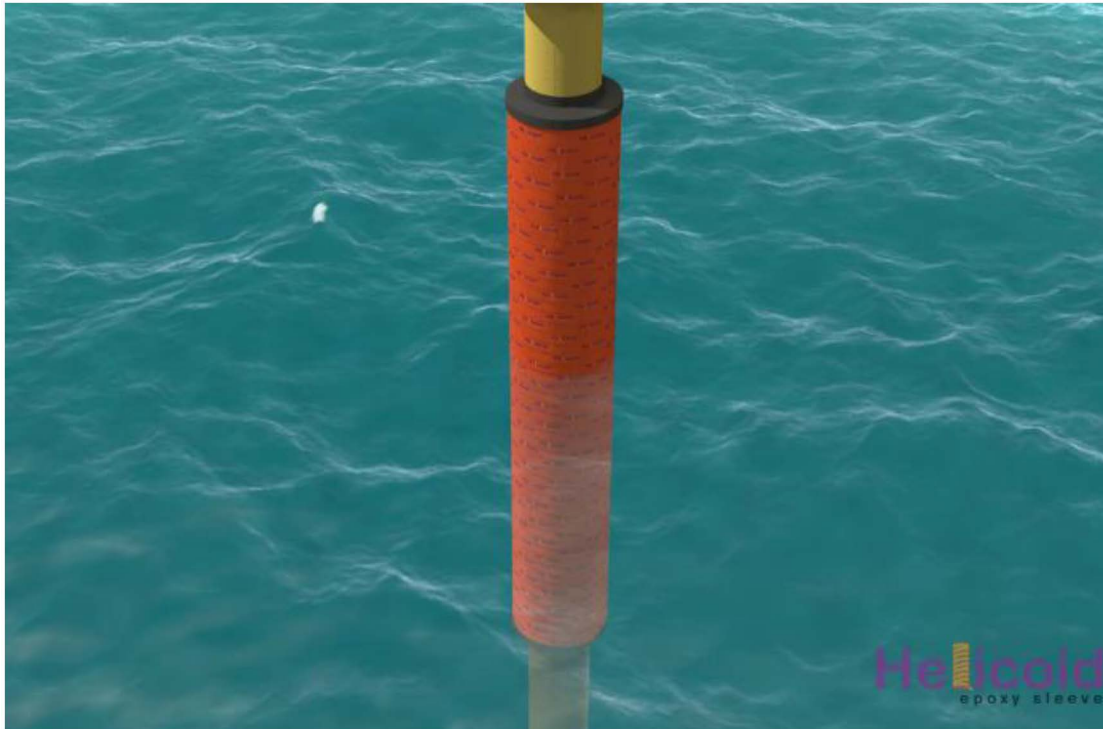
Typical Helicoid Epoxy Sleeve Installation
